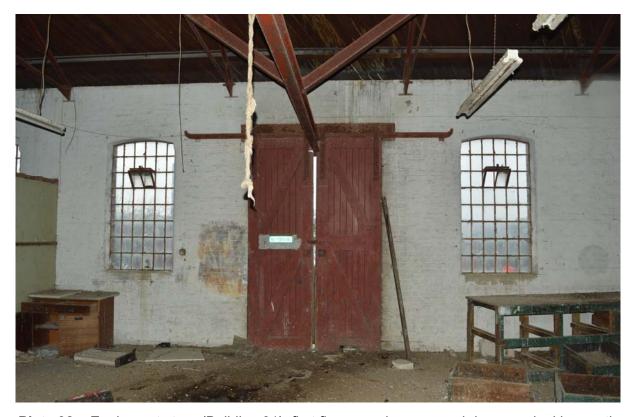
Equipment store (Building 31), first floor, goods crane and doorway, looking north (SGA15-208)
